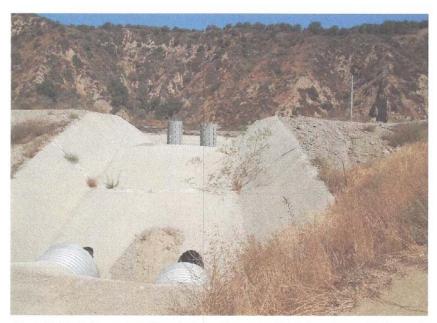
Cracked concrete spillway between two parts of Basin D and vegetation in crack
